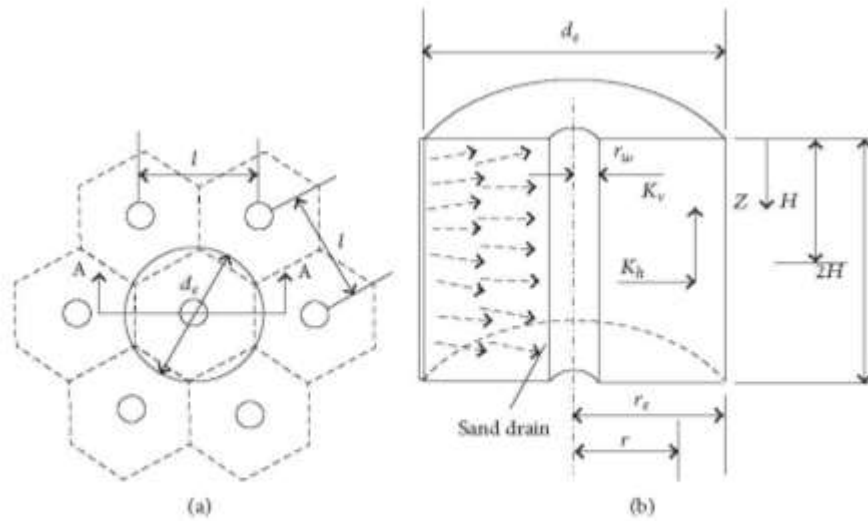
The computational model of one sand drain: (a) the floor plan; (b) A-A section plan.
